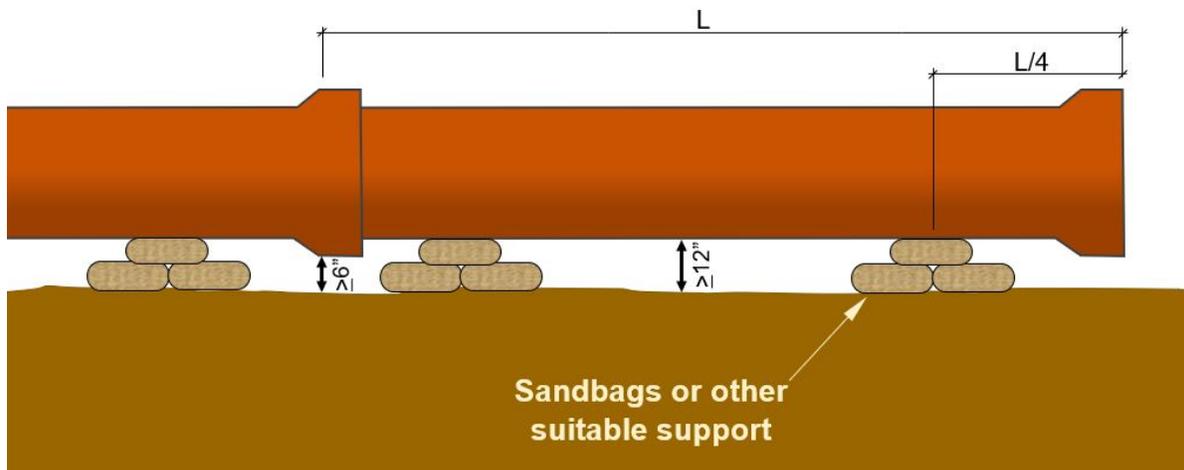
Typical configuration for pipe support before CLSM placement.
